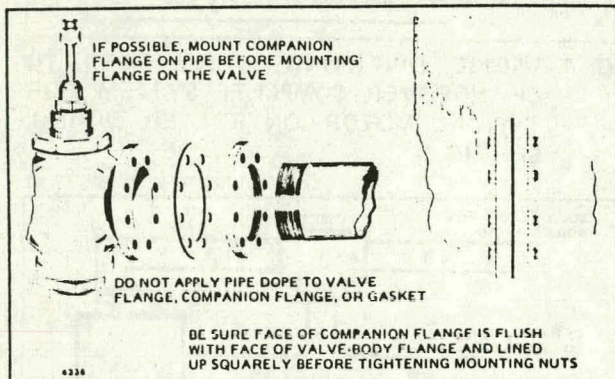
MOUNTING OF FLANGED VALVE BODIES.
